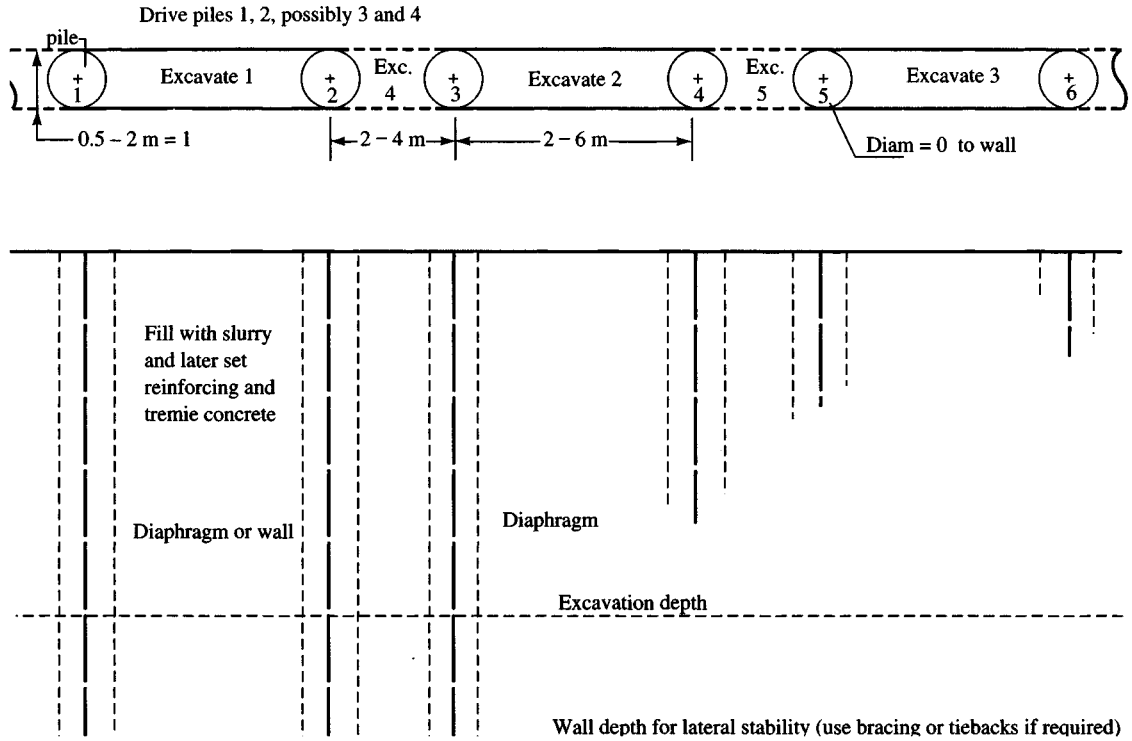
Slurry method for diaphragm wall. Drive piles for tying wall sections together. Excavate as zones 1 and 2, perhaps 3 using slurry to keep excavation open. Set rebar cages and tremie concrete for wall 1, 2, perhaps 3. Excavate zone 4, perhaps 5 using slurry, set rebar cages and tremie concrete to complete a wall section.
